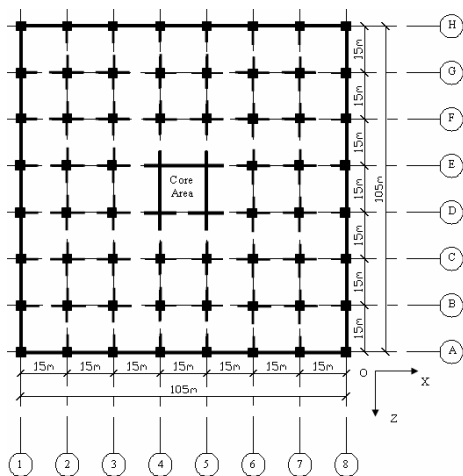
Typical Floor Plan of the 32-Storey High-rise Building
